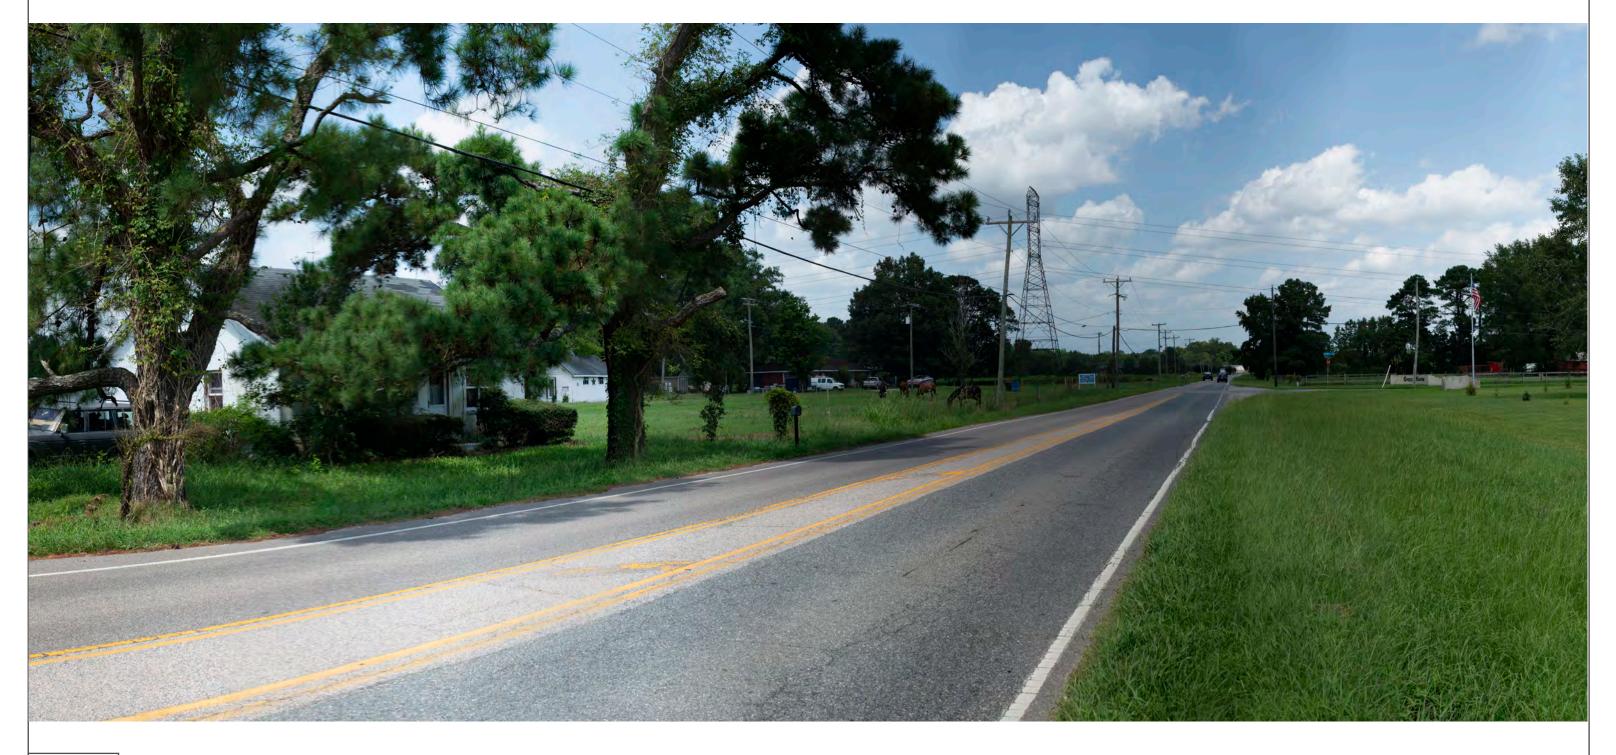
Viewpoint SP19 - HF Hybrid Route On Mt. Pleasant Road/North Landing Road bridge- 131-0044 and 131-5333
